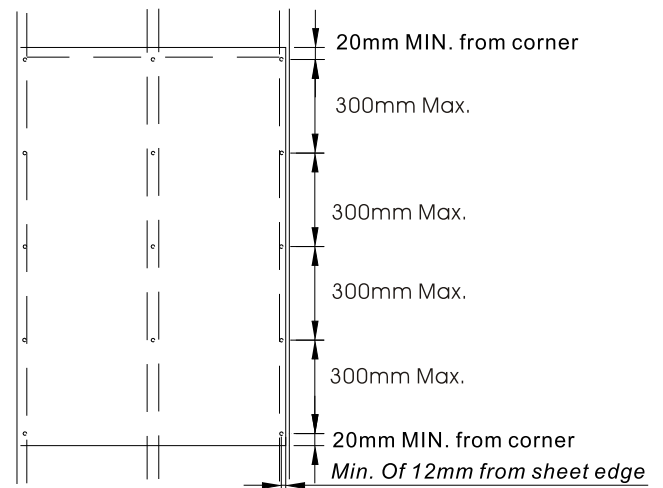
SPACING OF FIXINGS -SHEET PLACED ALONG JOISTS
